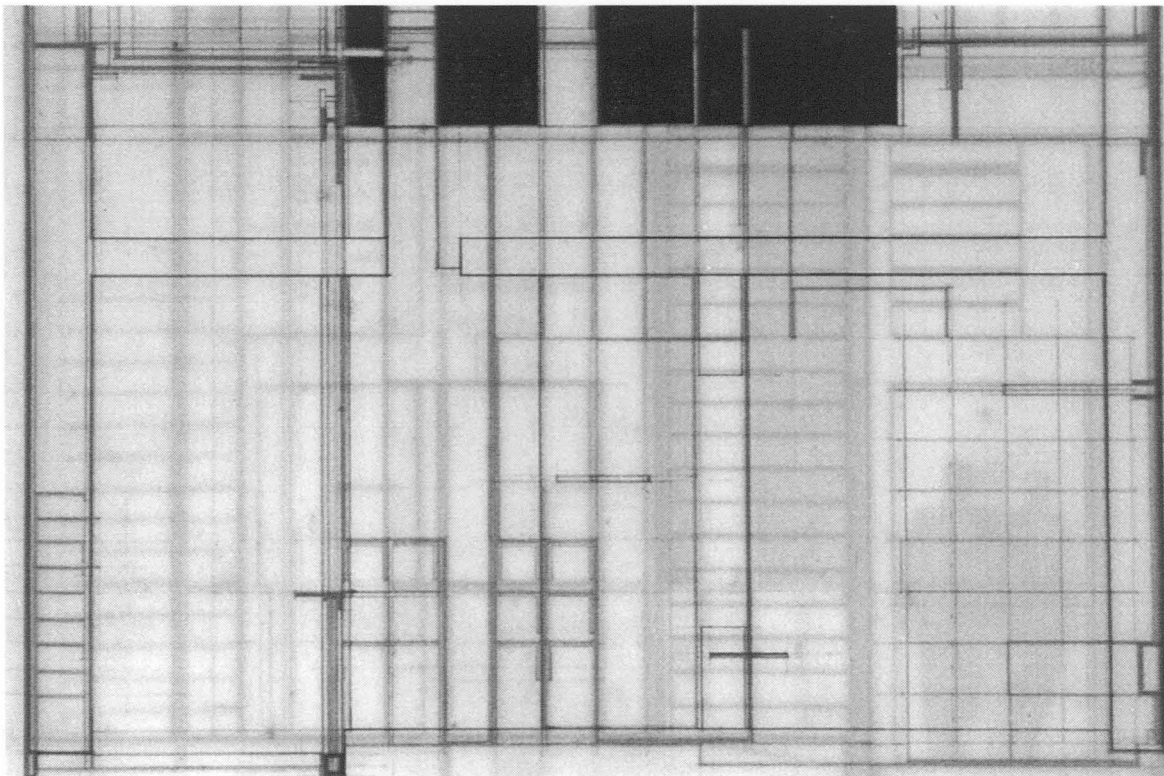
State Street Elevation- Madison Metro Bus Stop Seating
